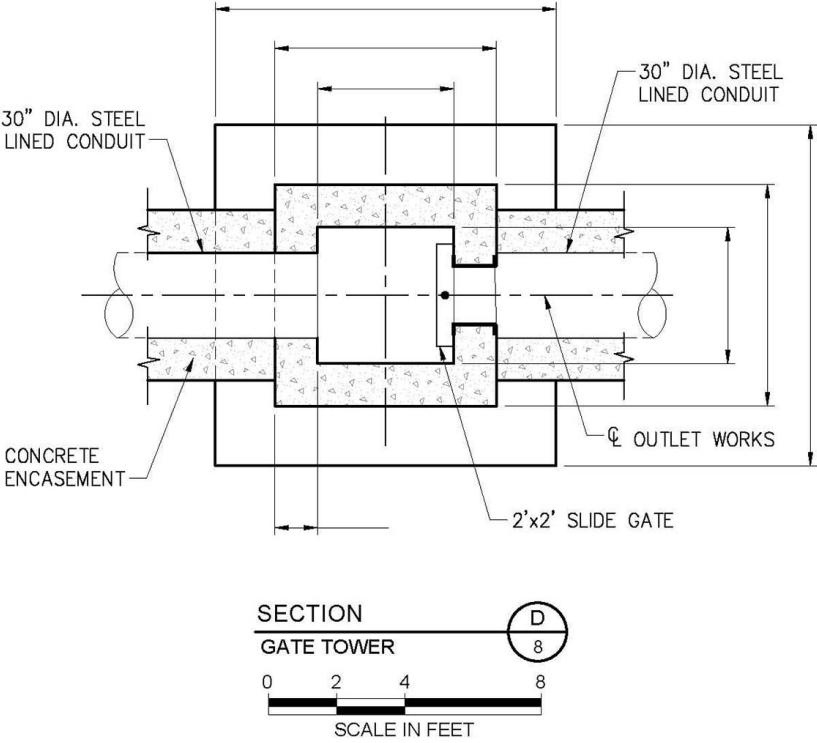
S-14. Dimensioning of Concrete Gate Tower
